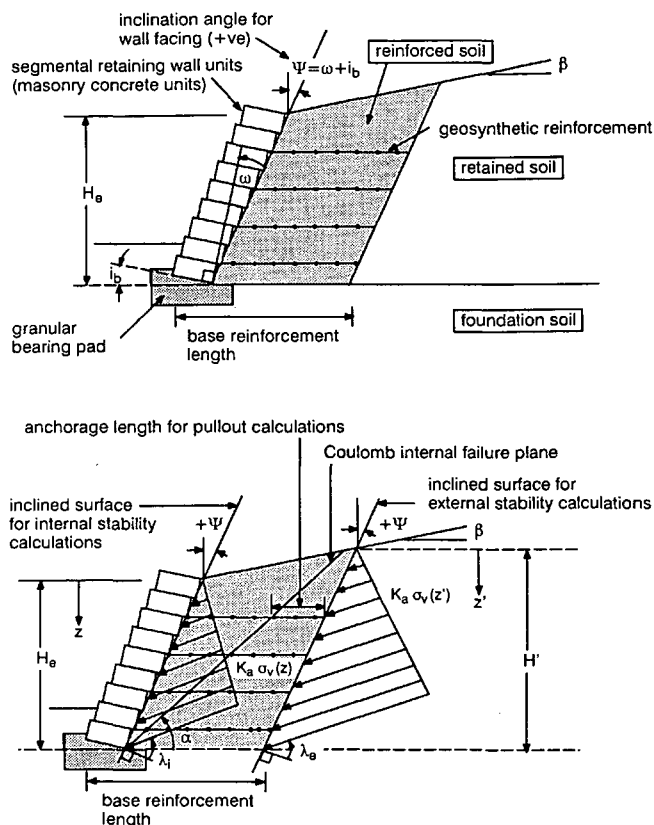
Principal components, geometry, and earth pressures assumed in NCMA method: *top*, principal components and geometry for segmental retaining wall systems; *bottom*, principal geometry and earth pressure distributions.
